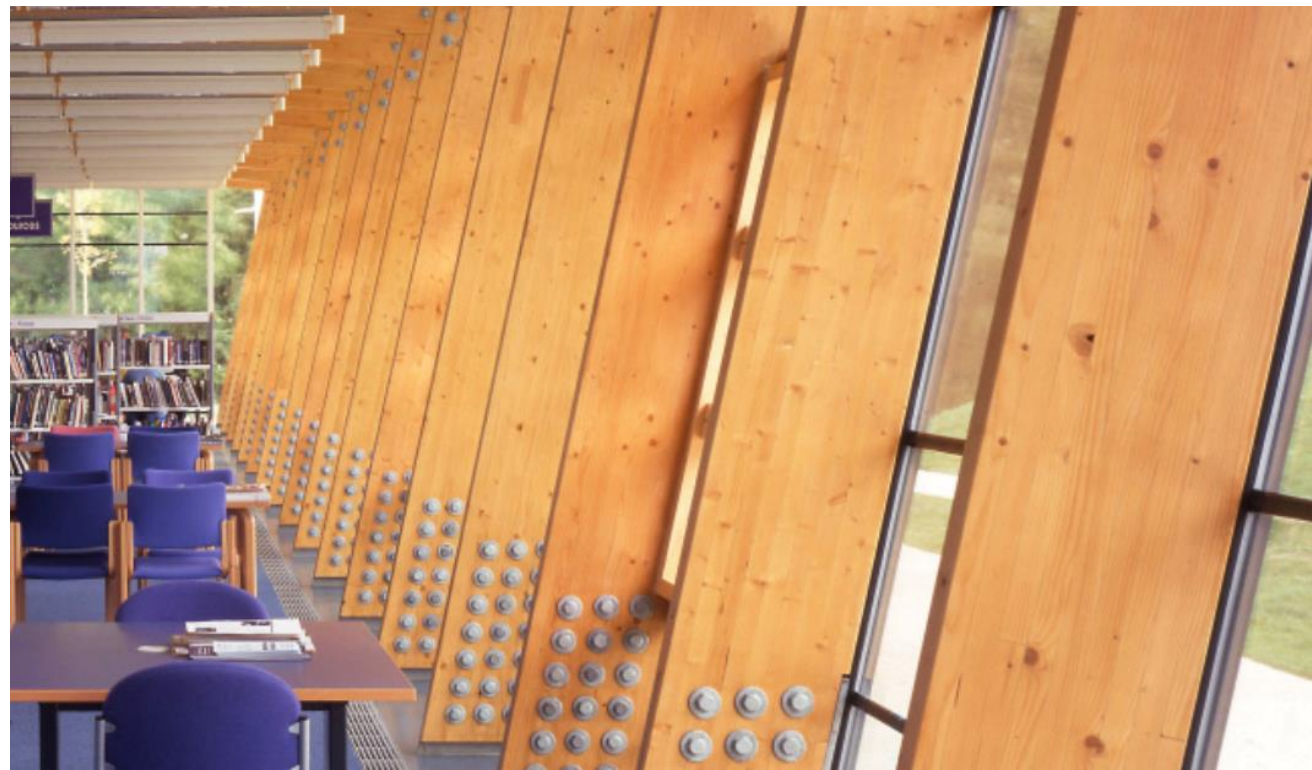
Glulam facade column example (March Library, Cambridgeshire, UK\_Bernard Stilwell Architects)
